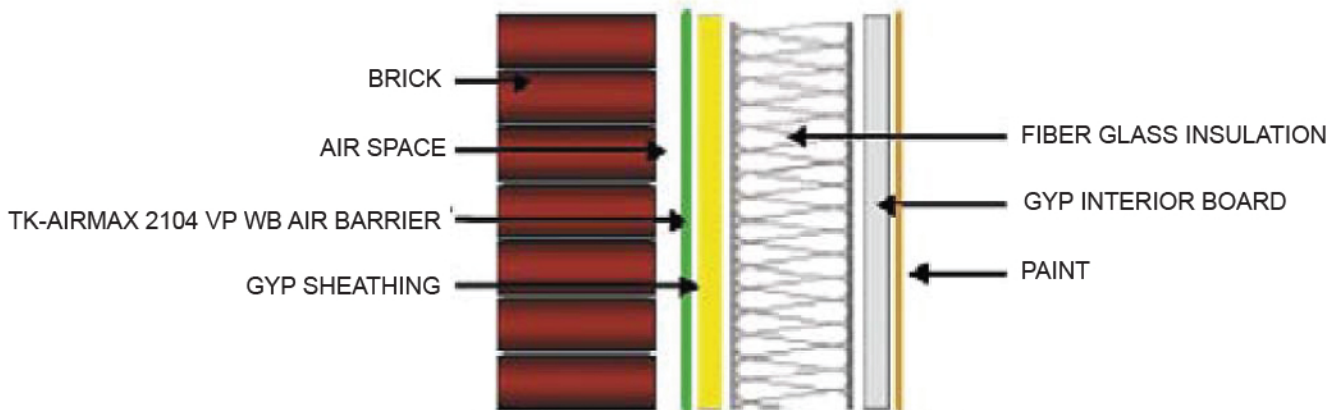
BRICK VENEER W/INSULATED STUD BACK UP WALL W/VAPOR BARRIER
